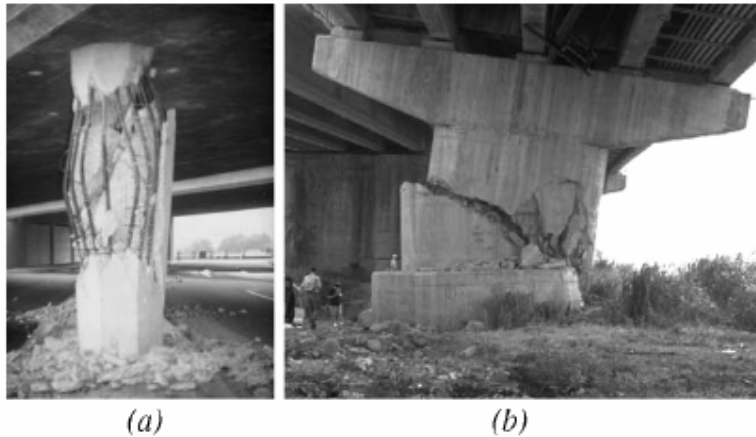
(a) Column damage, Route 5/210, San Fernando earthquake; and (b) damage to squat column, Wu-Hsi Bridge, Chi-Chi earthquake.
